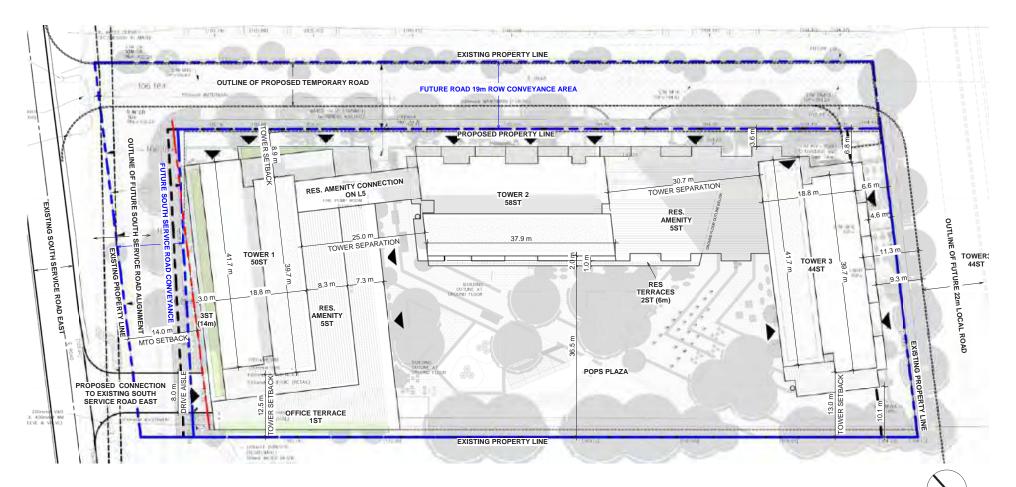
Site Plan (Prepared by: Sweeney & Co.)
